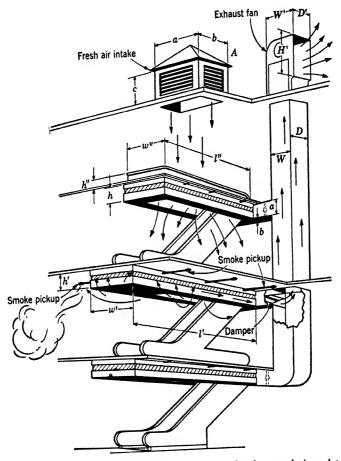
Sprinkler-vent method of wellway fire protection for a typical escalator, single flight, reversible.
